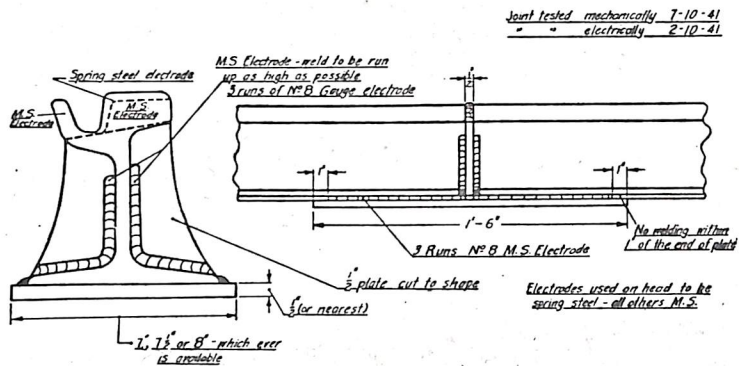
Electric Welded Joint, 102.06 lb. Rail.
